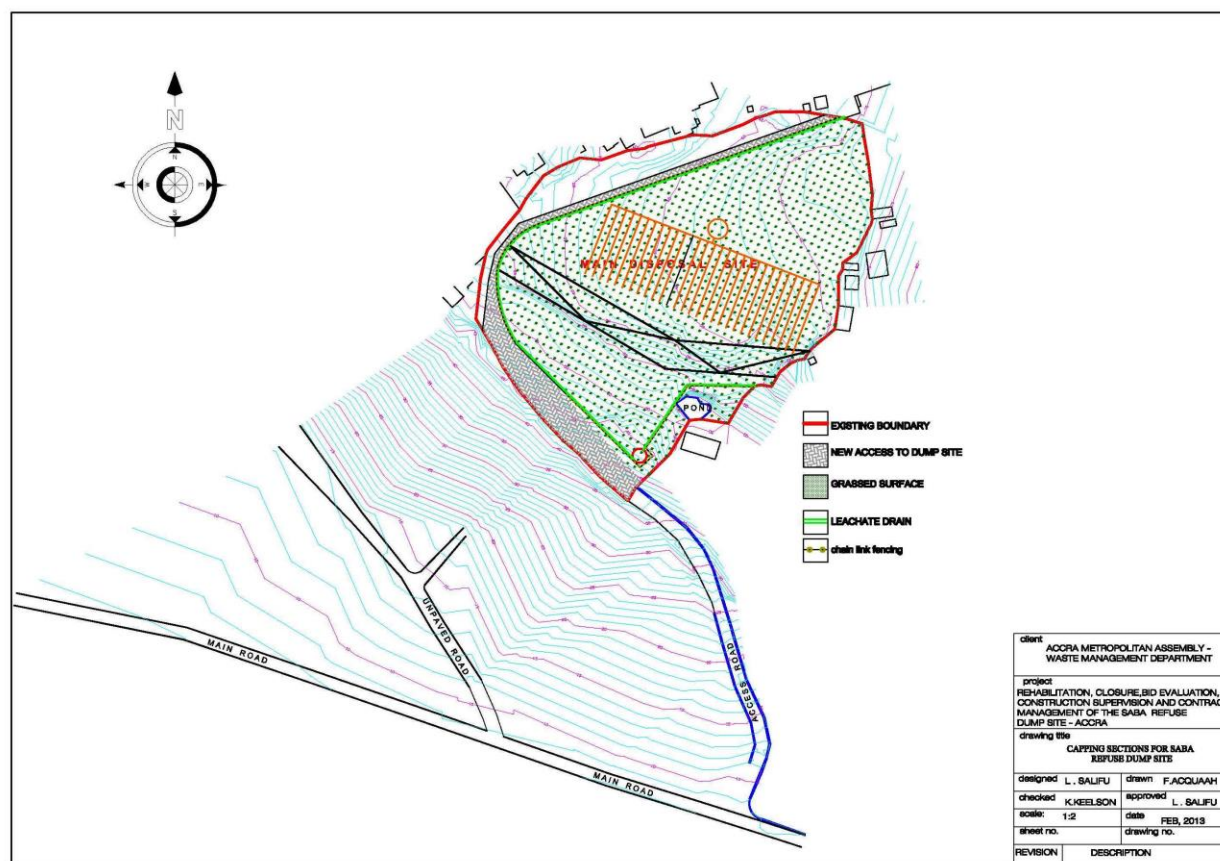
Proposed Layout of Rehabilitated Saba Dumpsite
